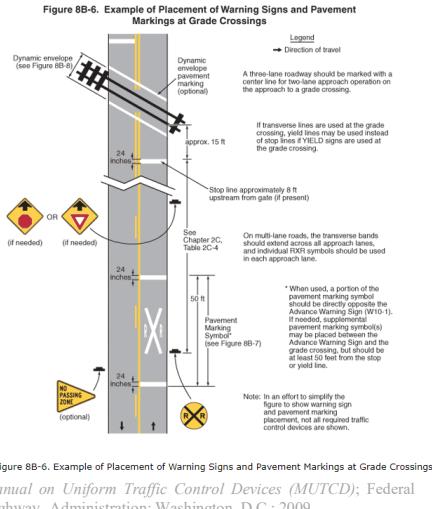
B-6. Example of Placement of Warning Signs and Pavement Markings at Grade Crossings
